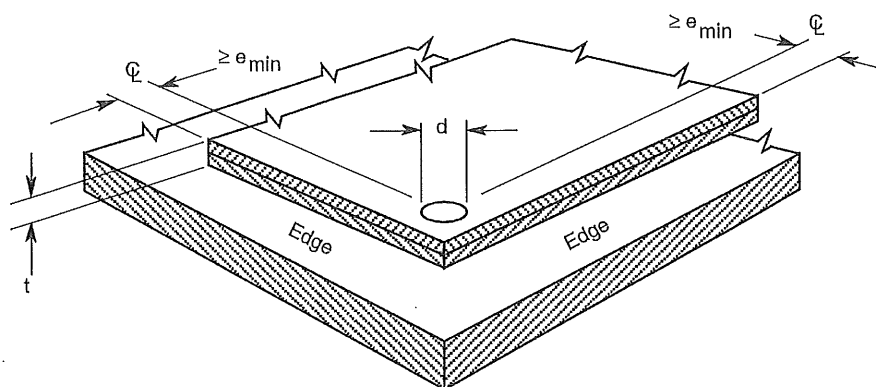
Edge Distance for Arc Spot Welds – Double Sheet
